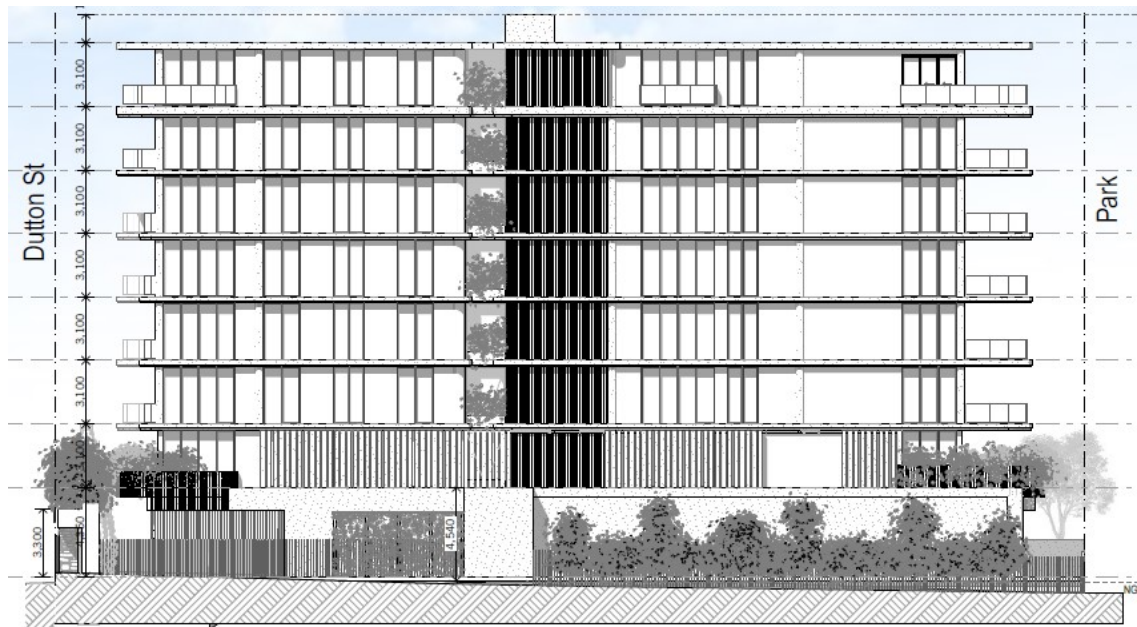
Side (south) elevation (Source: Lightwave Architecture)
